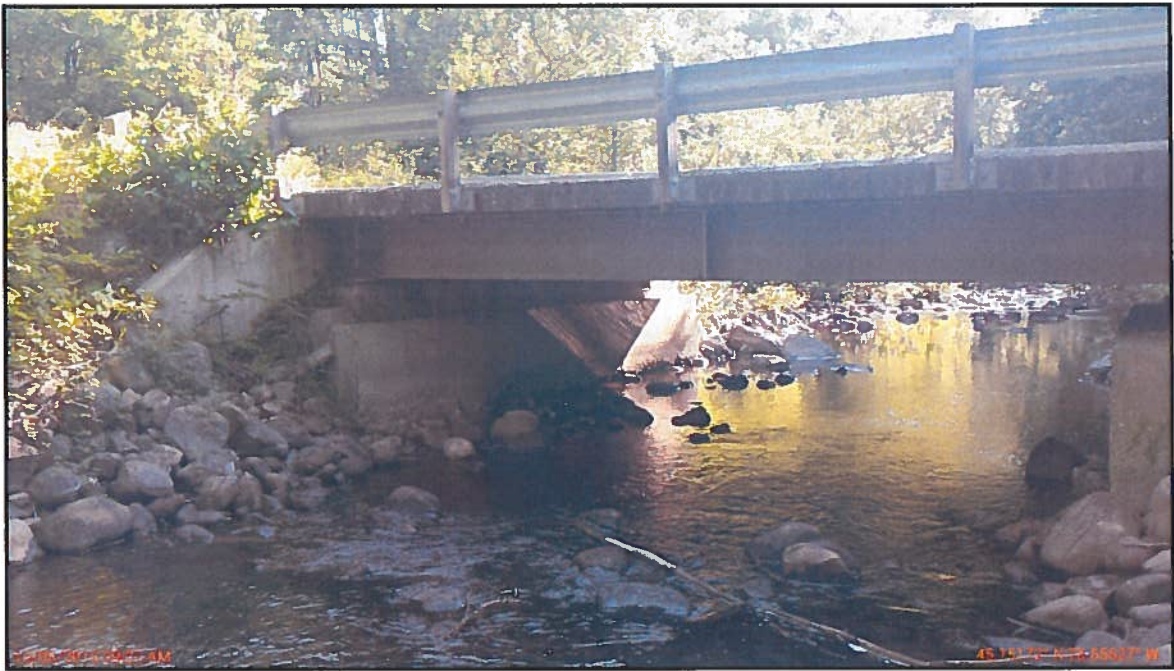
General Arrangement – Northwest Embankment Looking Northeast
